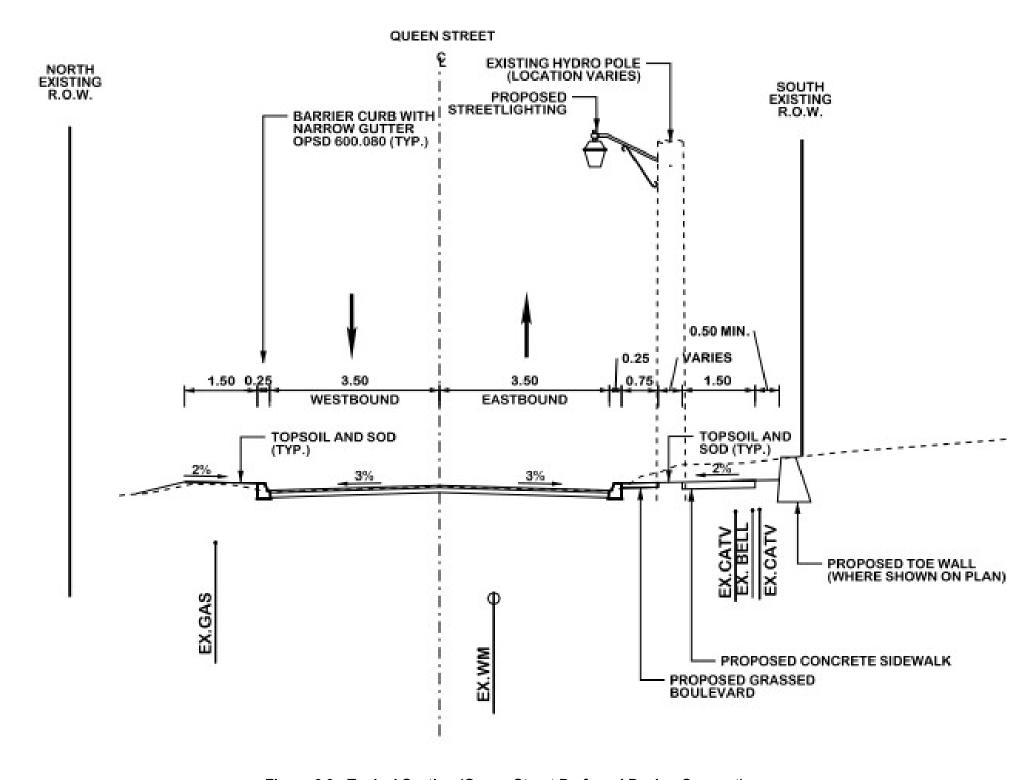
Typical Section (Queen Street Preferred Design Concept)
